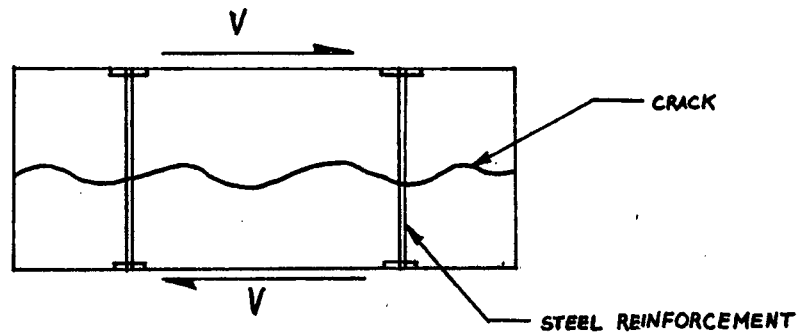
Transverse Crack in Reinforced Concrete Specimen
